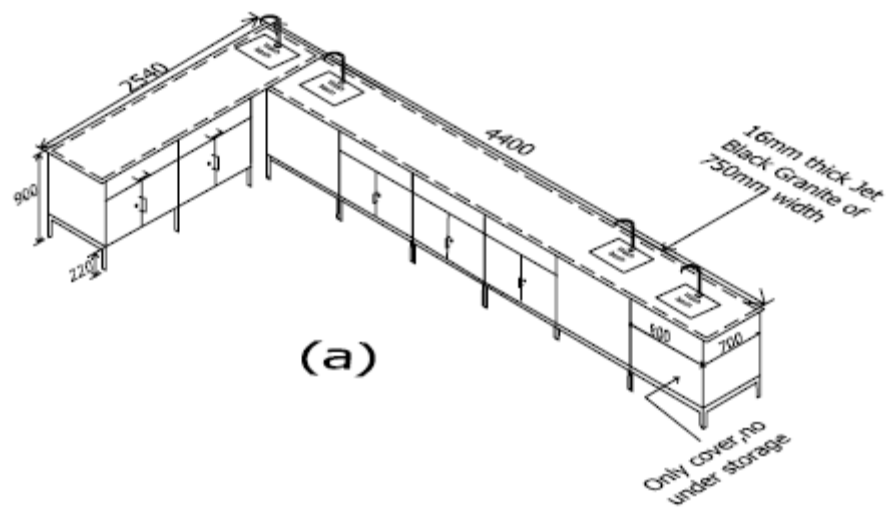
Fig. D. MS Laboratory Fixtures for Product Testing lab (All dimensions are in mm).
